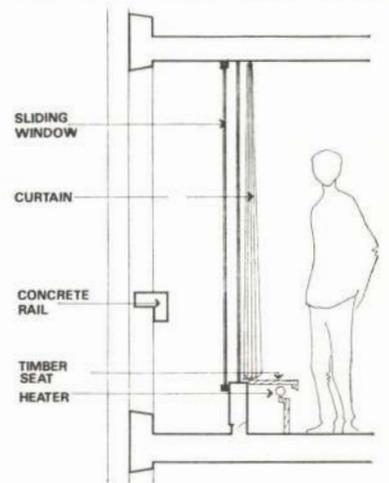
Somerville College, Oxford, stage III, Wolfson Building.
